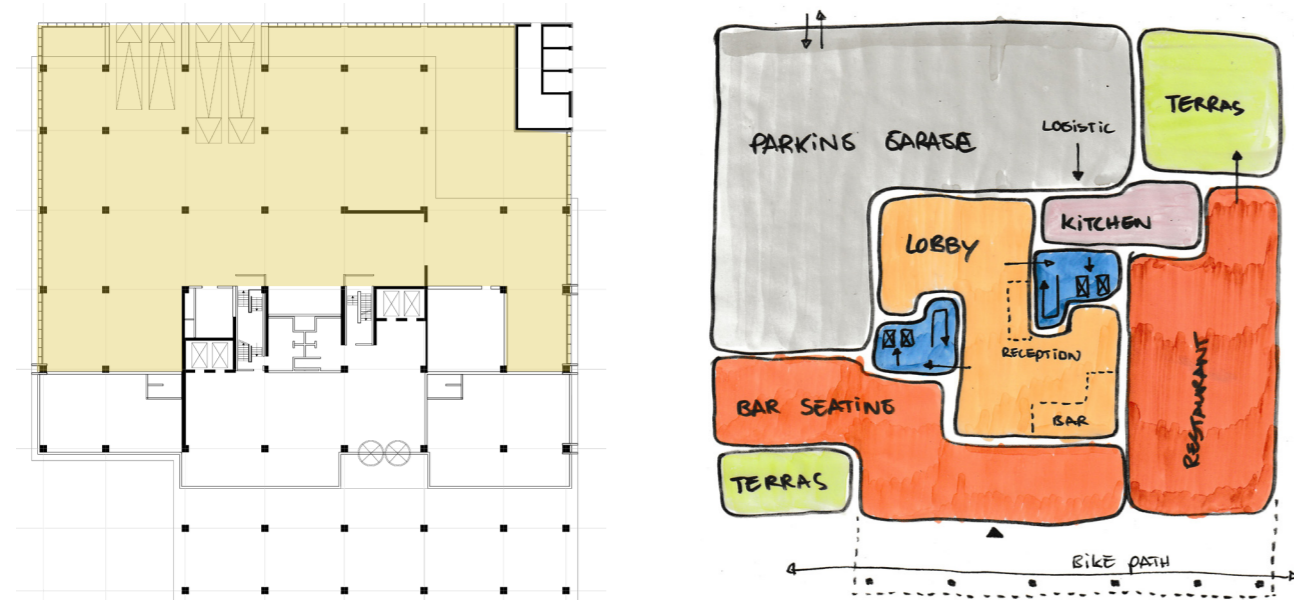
Old (yellow=parking) vs new ground floor plan layout (Lars Haga, 2026)
